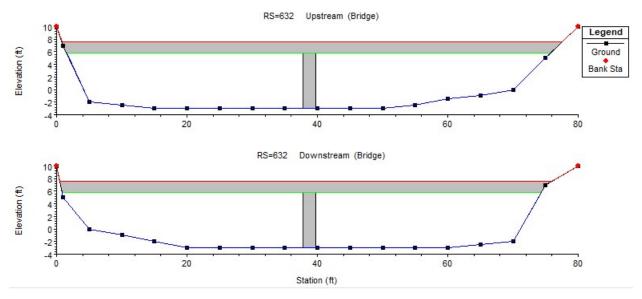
HEC-RAS Parameterization of La Plaza Avenue South Bridge
